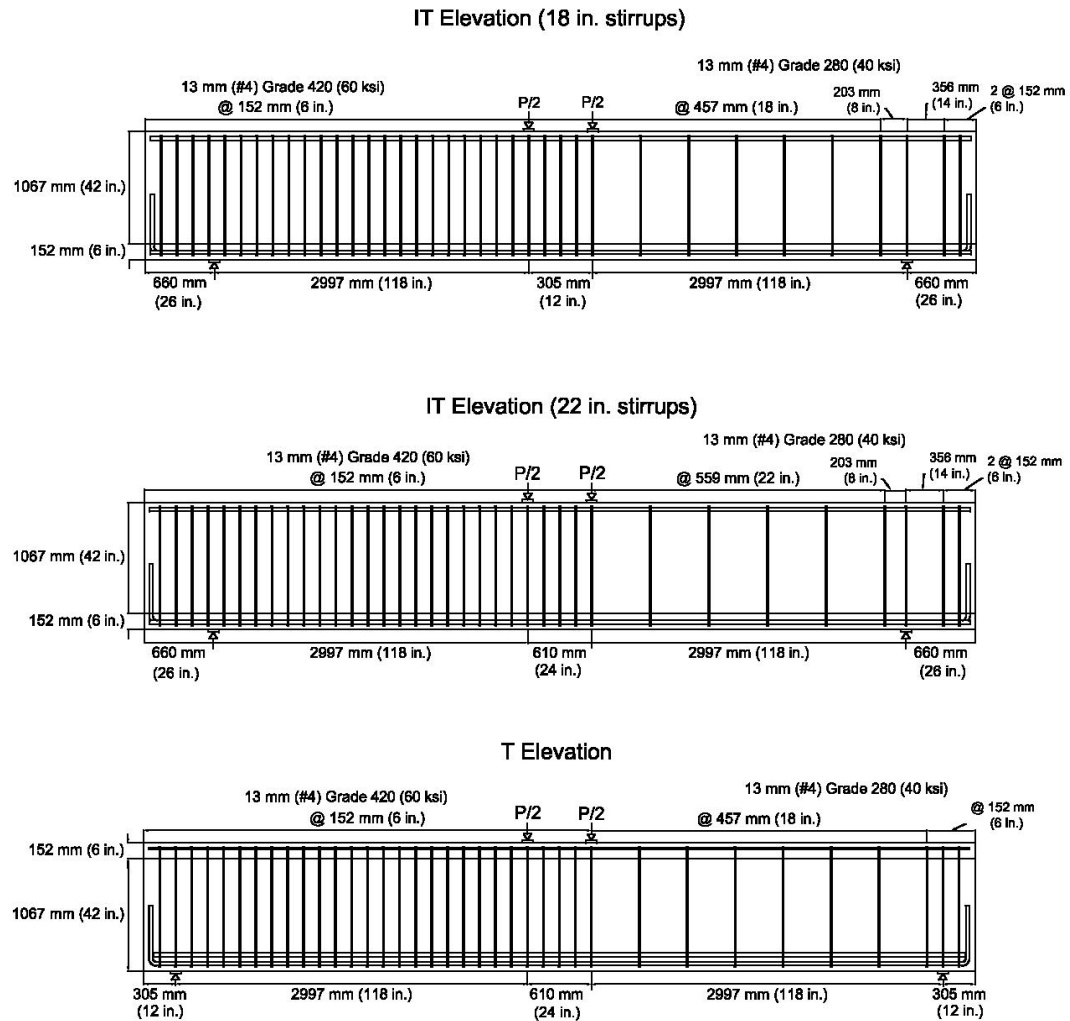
Specimen elevation view with internal steel reinforcing
